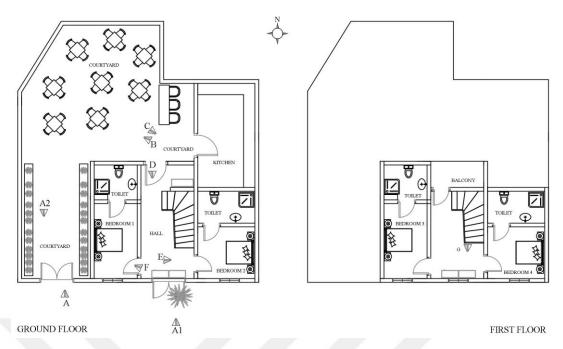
"Dört Element Boutique Hotel" Cehri Okyar, ground and first floors plans (S.Sevimbige archive, 2017)
